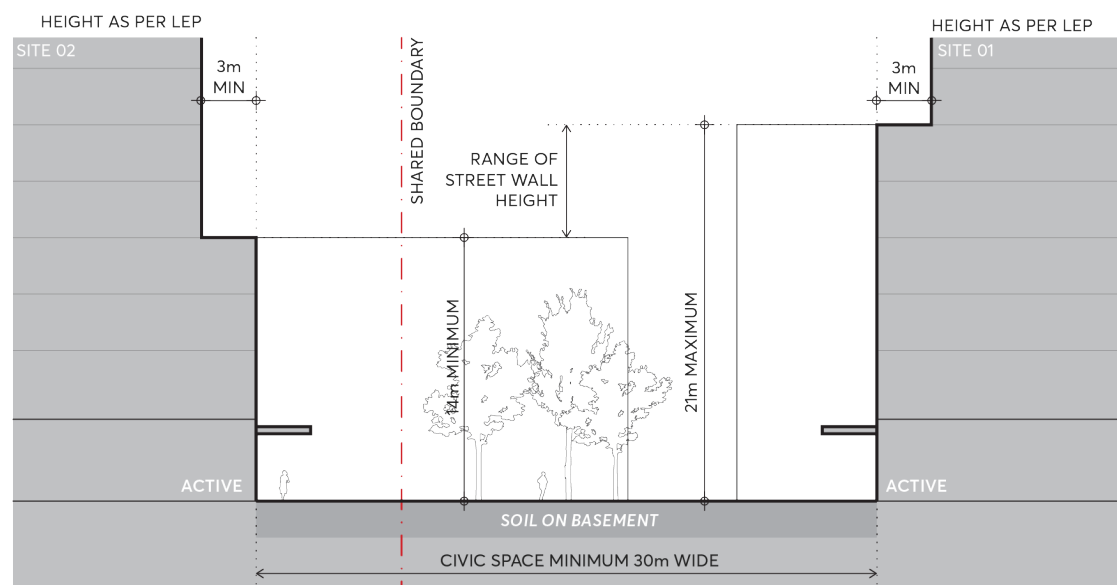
Civic Space (Section J) Setbacks and Street Wall Height
